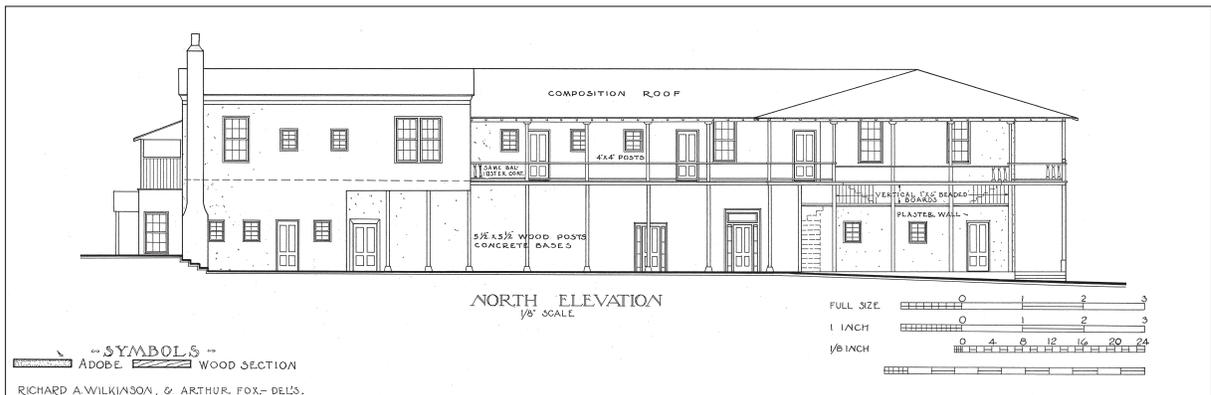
MEXICAN PERIOD ARCHITECTURAL STYLE – CASA BANDINI
